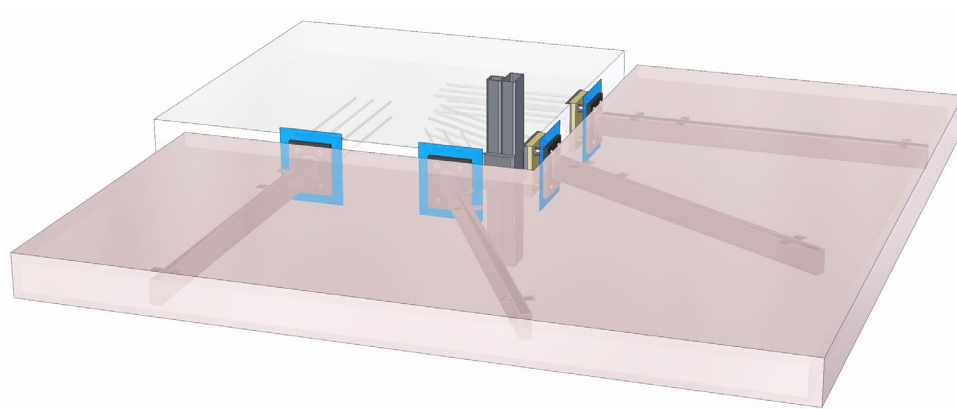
Illustration showing BWC 40 U-H equipped with weldment plate against floor edge and a corner steel column
